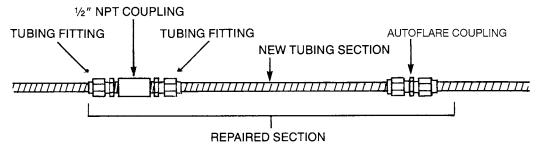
Repair of Damaged Tubing with a New Section of Tubing and a joint splice or an AutoFlare Coupling
